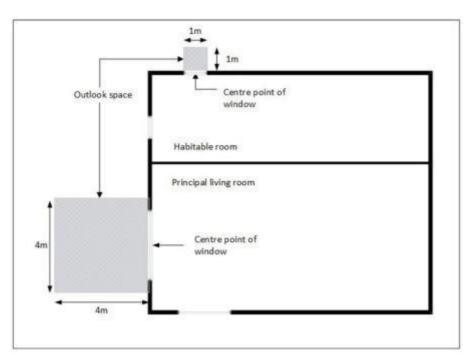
outlook space requirements for development containing up to three dwellings (H5.6.12.A1 & H6.6.13 A1)
